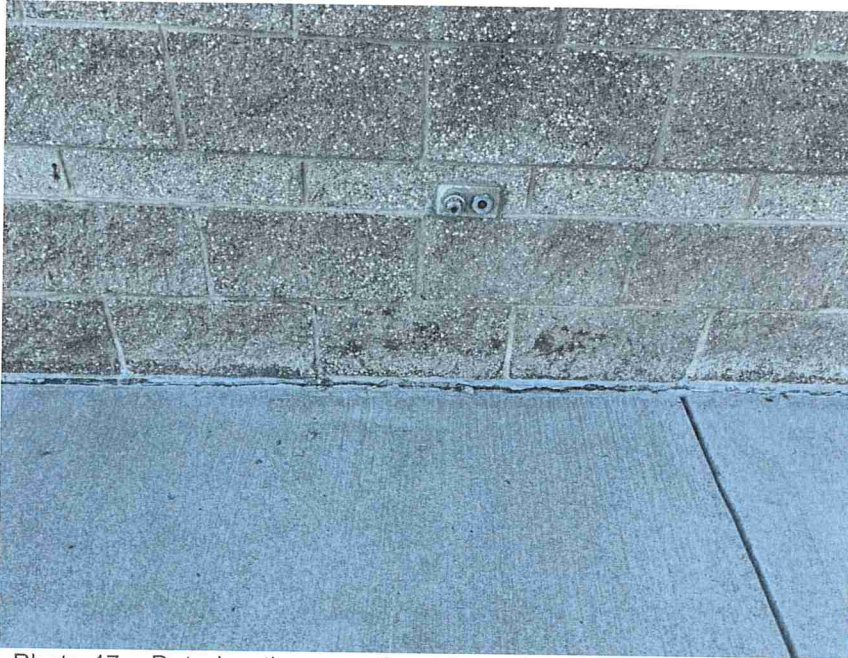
Deterioration near the sidewalk was observed on the exterior face of the split-face CMU.
